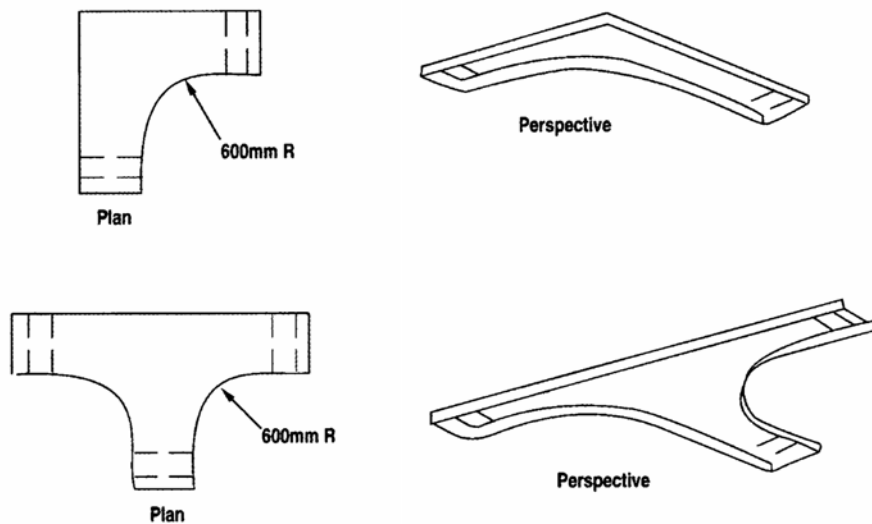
TYPICAL EXAMPLE OF A TRUNKING SYSTEM
